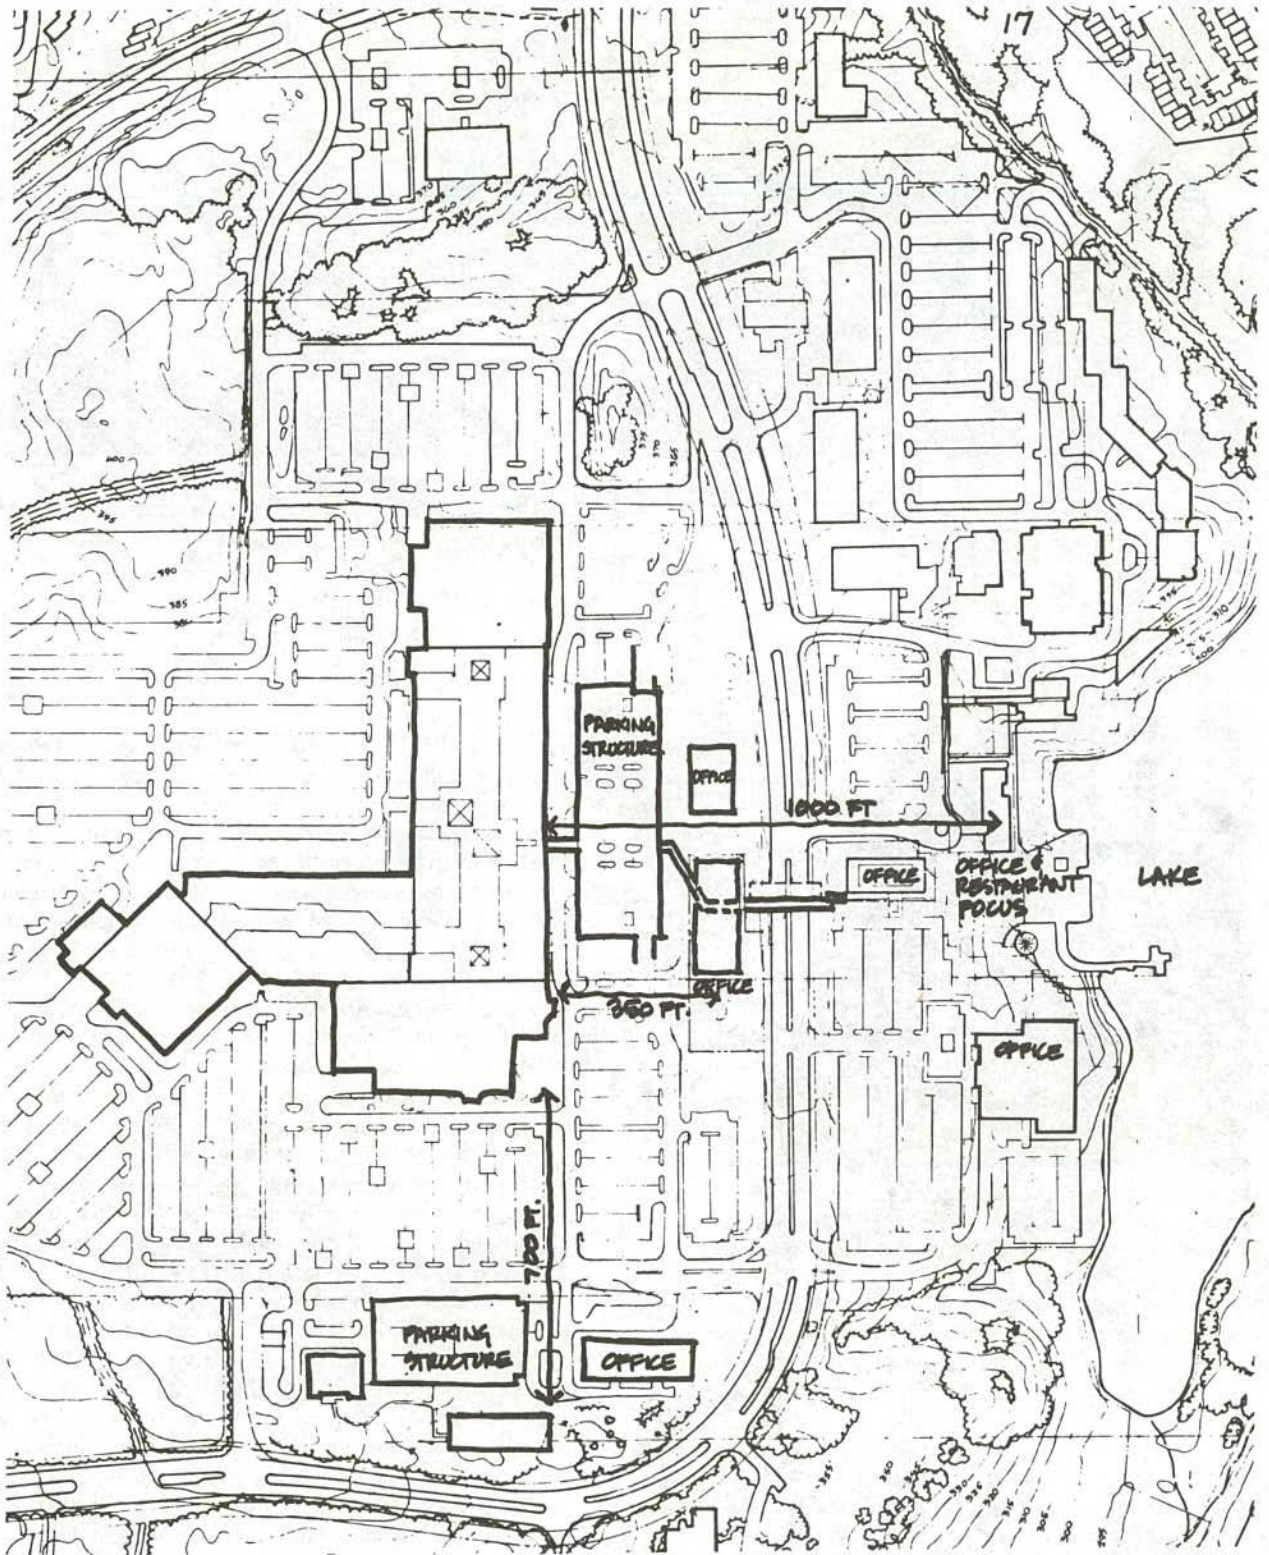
Site layout showing orientation of structured parking on the mall side attracting the most pedestrian trips.
